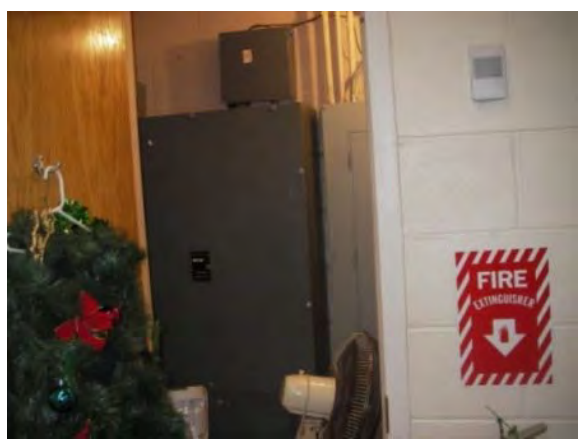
1960 ADDITION ELECTRICAL CLOSET WITH FANS BLOCKING ACCESS
